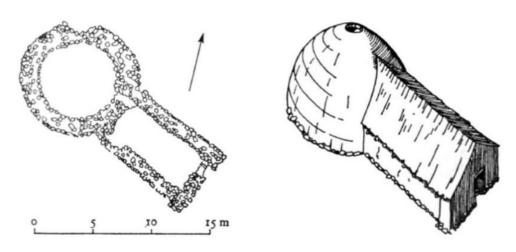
Reconstruction of a circular Halafian structure featuring a corbelled dome at Arpachiyah, Iraq (Mallowan & Rose, 1935).
